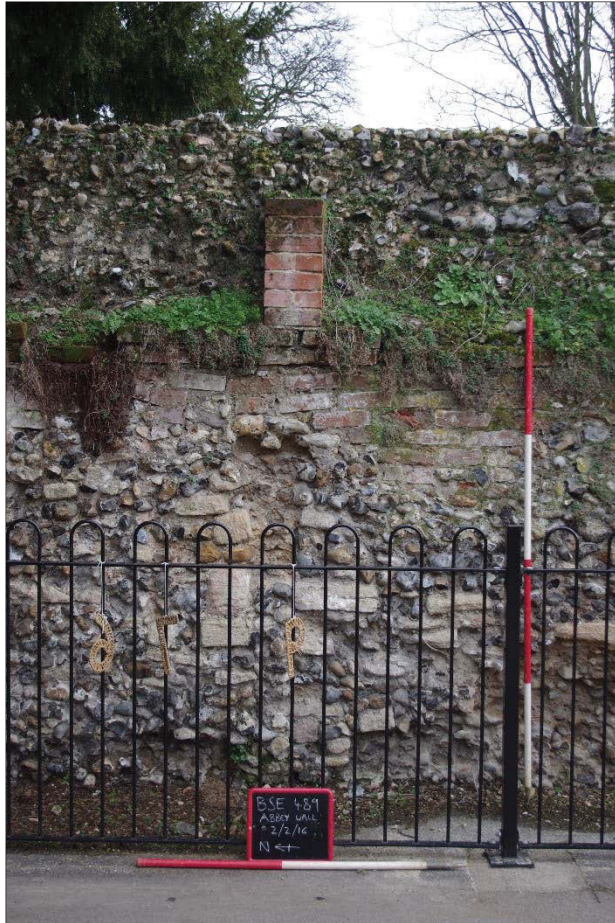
Western elevation of wall, from north (left) to south (1m scales, facing east)
